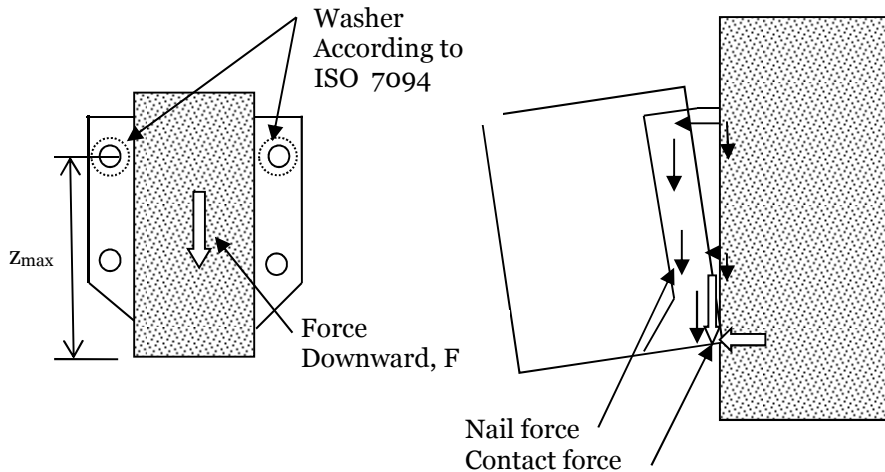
Left: Cross section in joist. Right: The joist will deflect and rotate, at the bottom a contact force will occur at the bottom plate, and the withdrawal forces in the bolts in the wall will vary linearly as assumed for nailed connections in the header.
